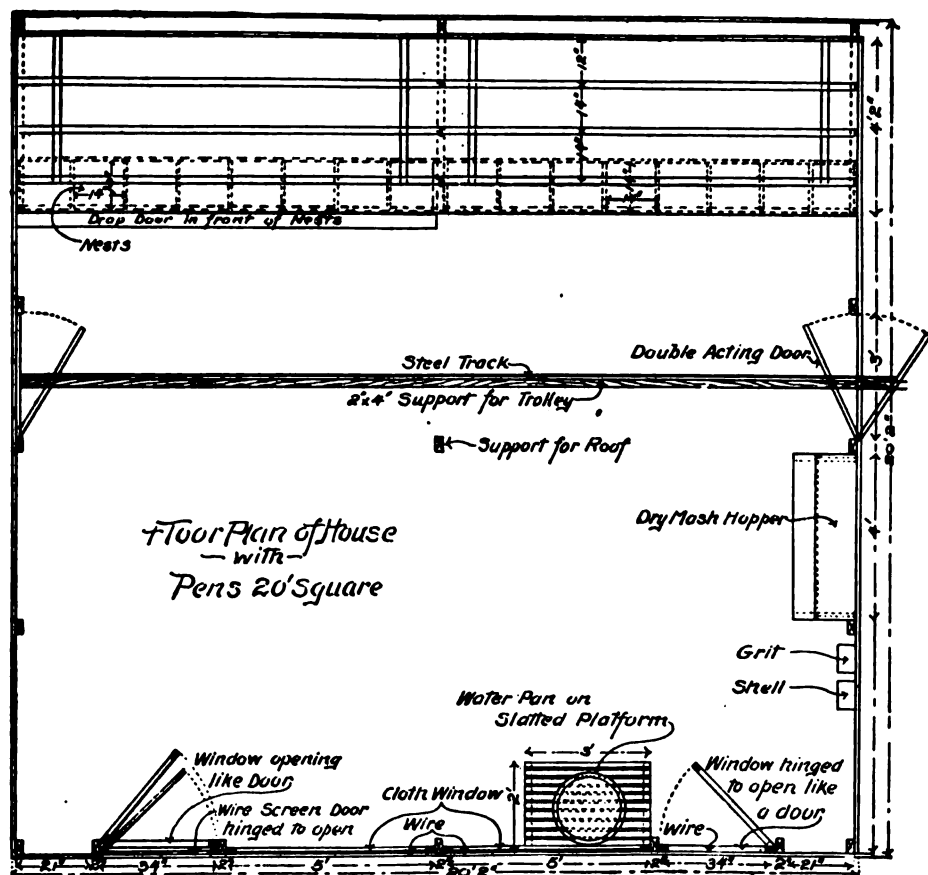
Floor plan of a Cornell poultry house with pens 20 feet square, showing location and dimensions of interior fixtures
